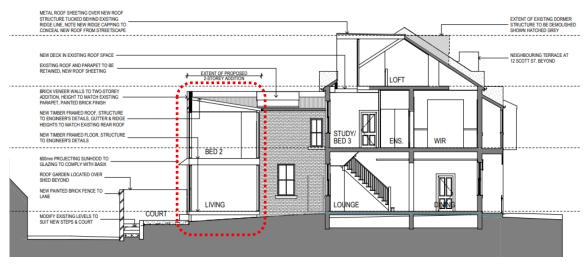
| SECTION SHOWING EXTENT OF PROPOSED ADDITION
